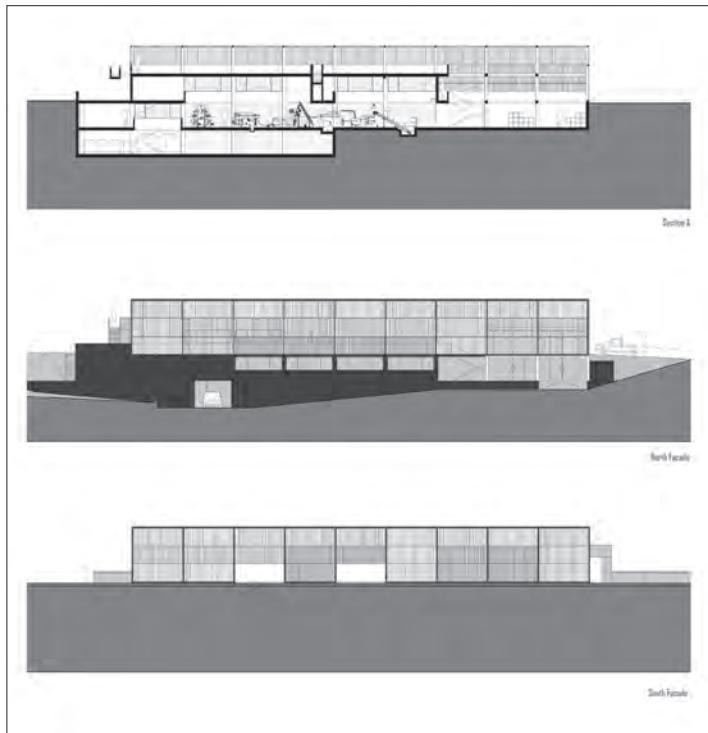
Olive-Oil Press, north and south elevation as well as longitudinal section drawings.
